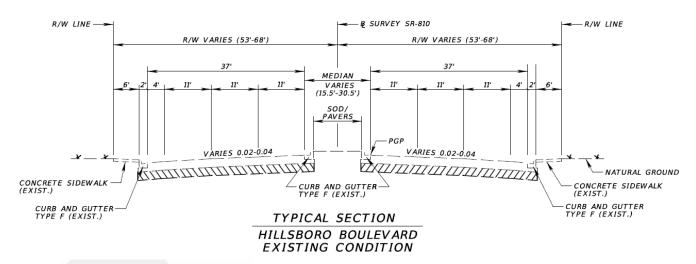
7: Existing Typical Section - Hillsboro Boulevard
